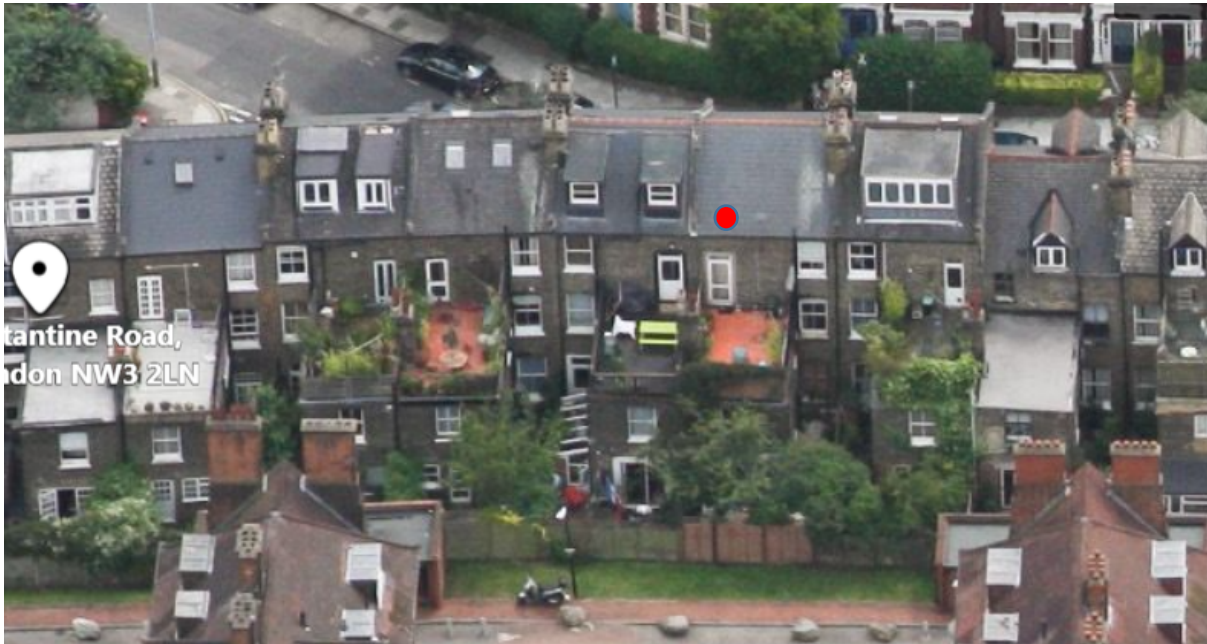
Rear elevations of terrace showing existing dormers and variety of fenestration at 2nd floor (site shown with red dot)
